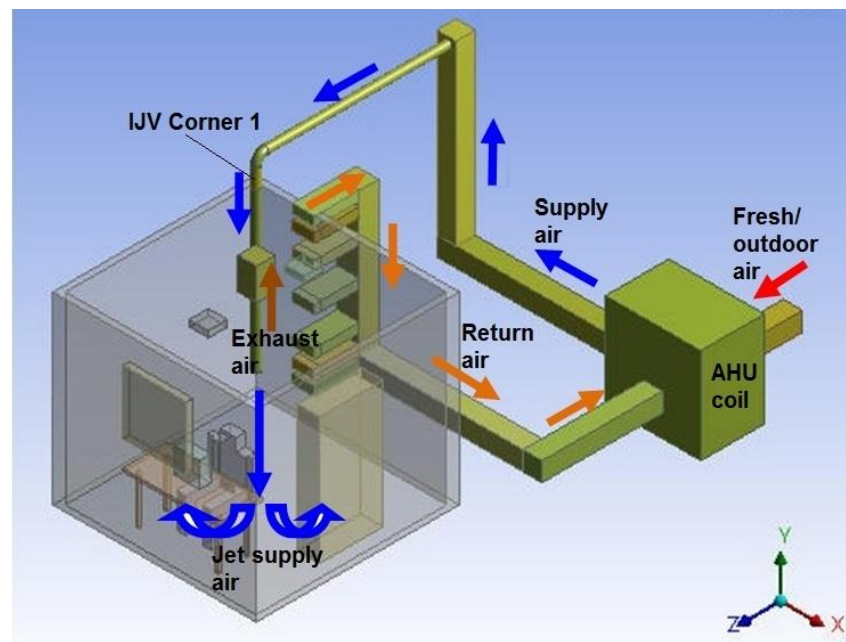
Air flow directions from/to room with connections to the air handling unit (AHU) coil, showing different return vent heights for the case of corner 1 supply air location.
